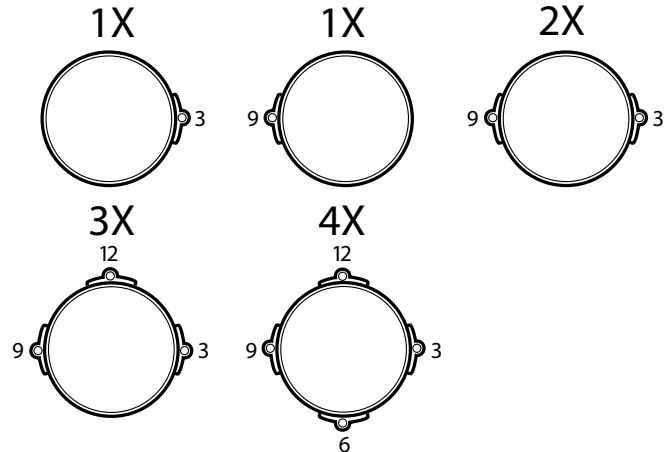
Typical TraceBOOST tracing positions on piping.
